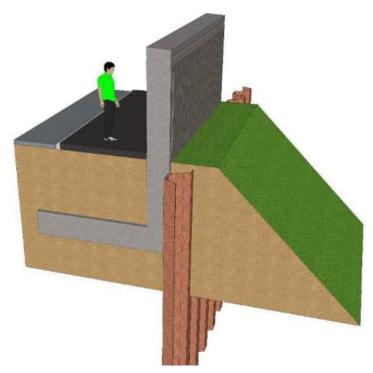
Schematic of Reinforced Concrete Cantilever Wall with steel sheet pile seepage cut-off
